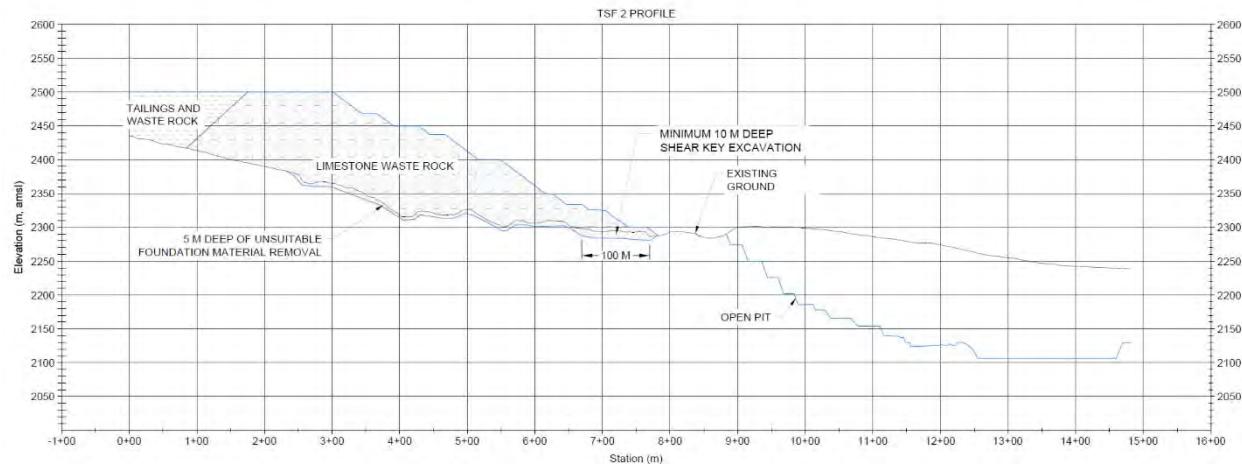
West Tailings and Rock Storage Facility Northern Portion Cross Section - LOM
